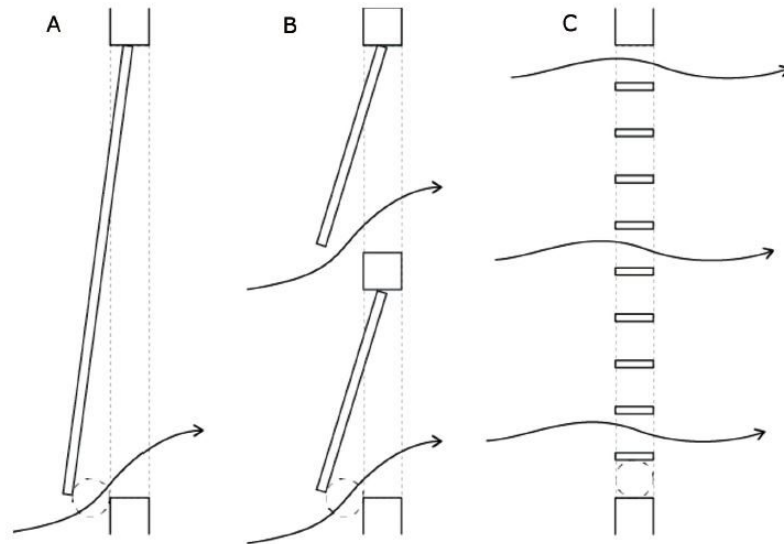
Typical PBSA window opening types (HNS, 2020)
